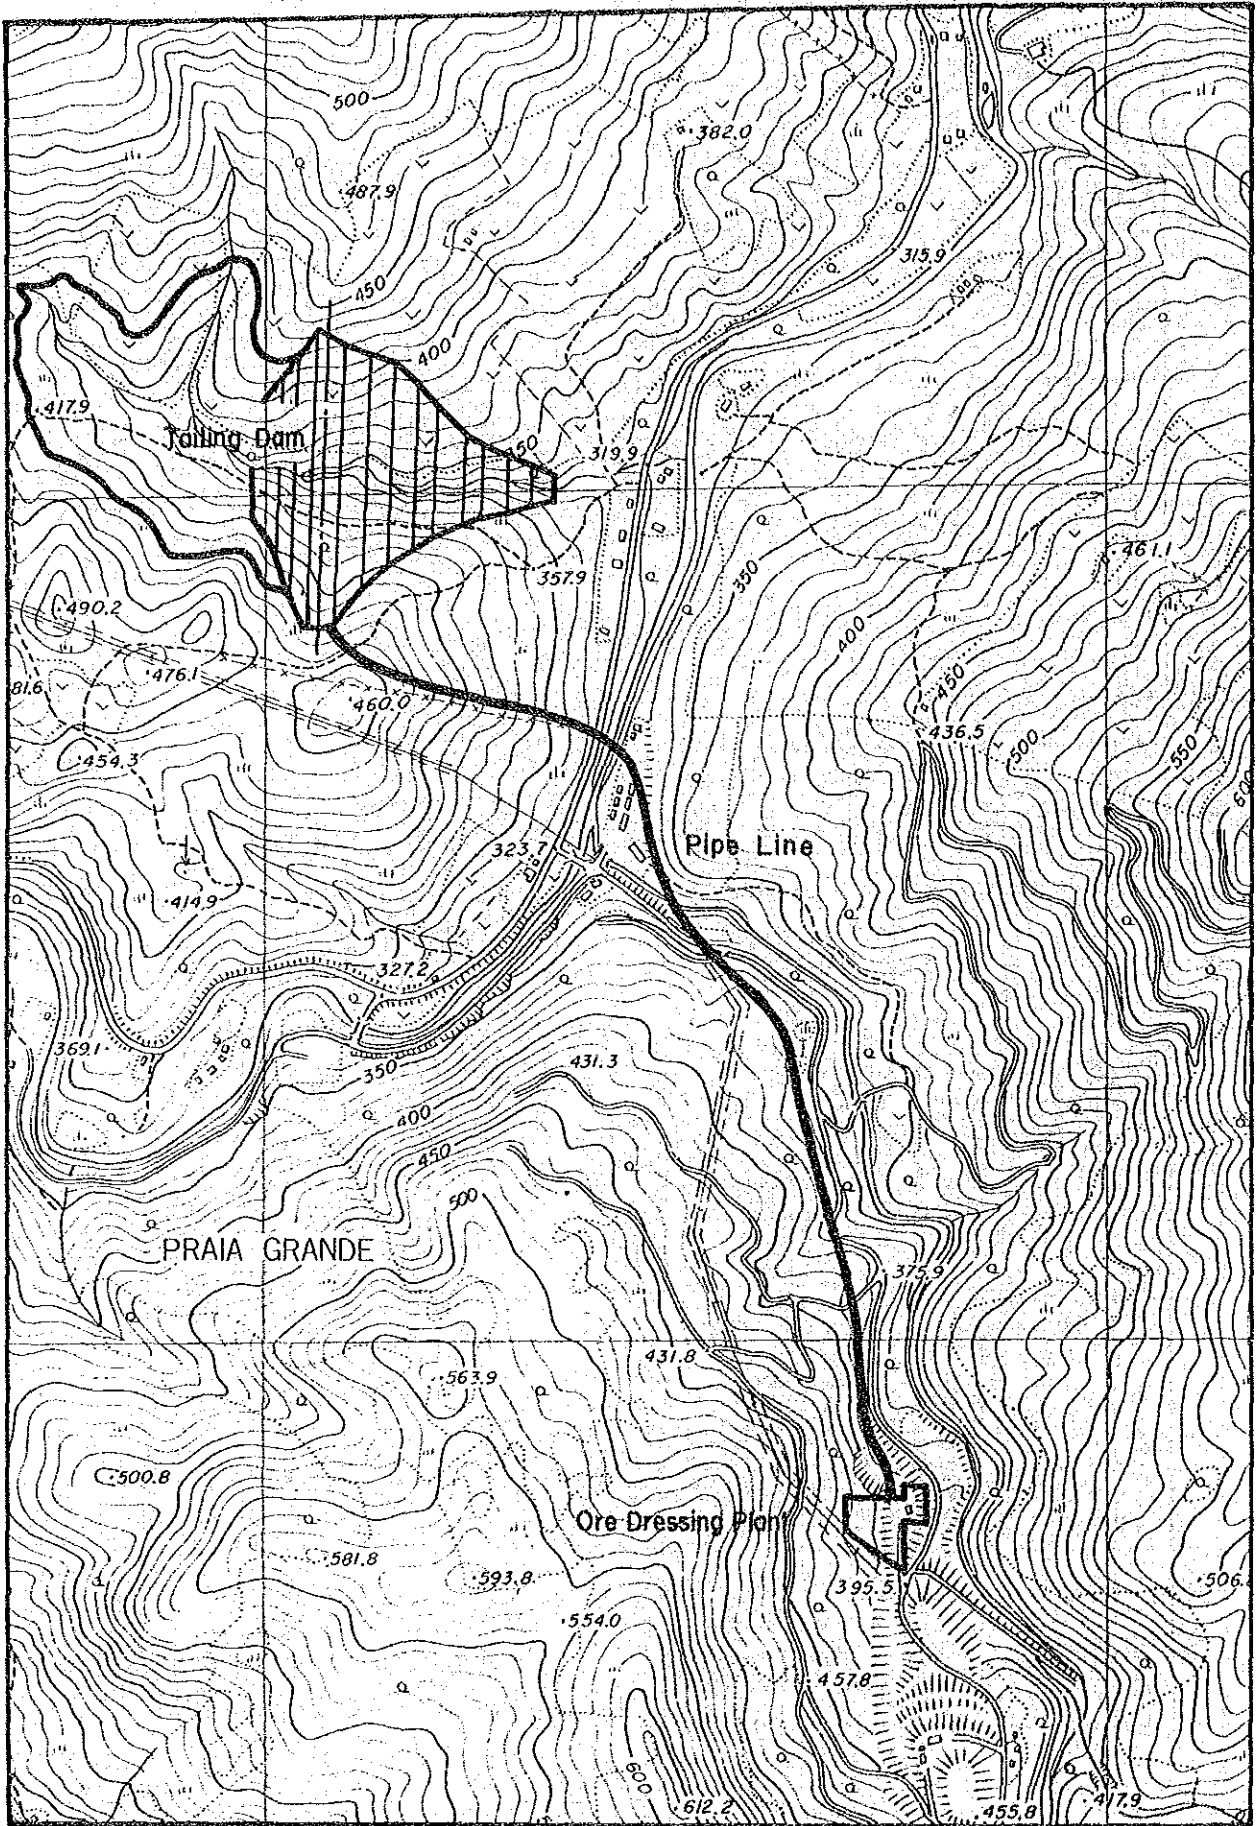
Location of Ore Dressing Plant Tailing Pipe Line and Tailing Dam
